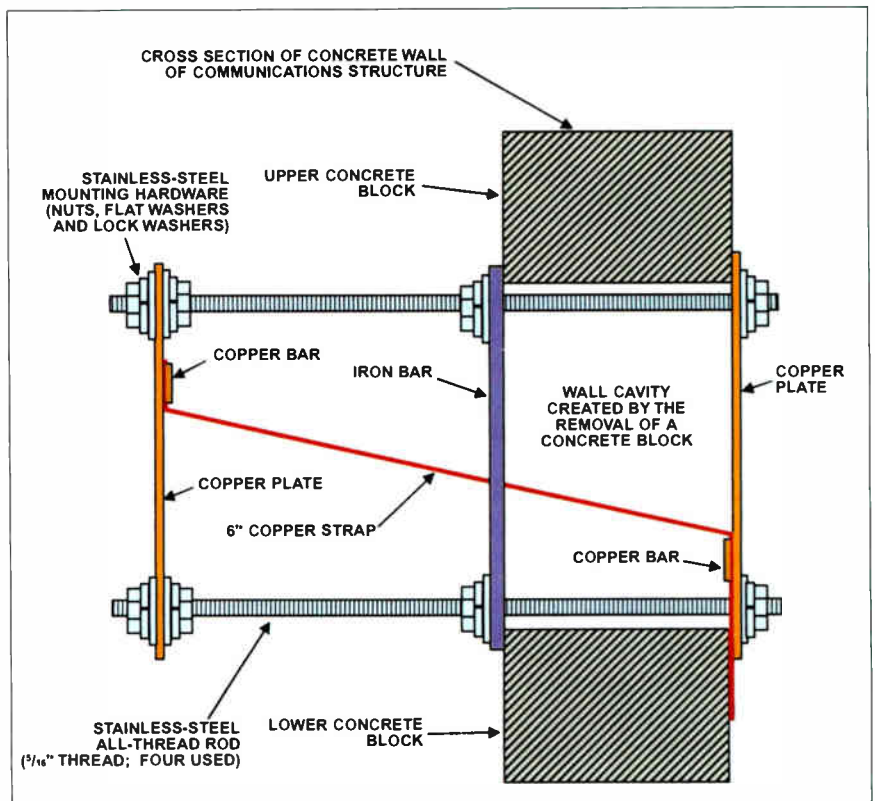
This shows a cross section of the concrete wall in a communications shelter. To install the homemade bulkhead and common grounding plate, a single concrete block is removed. The bulkhead/grounding plate is installed through the cavity and locked into place using stainless steel, 5/16" all-thread rods. Two six-inch copper straps are used to connect the inside plate to the outside plate and continue on down the outside wall to ground. The inside copper plate is used as the common ground mounting surface for the lightning-protection devices. The equipment cabinets are connected to this plate via 1 1/2" copper straps.
